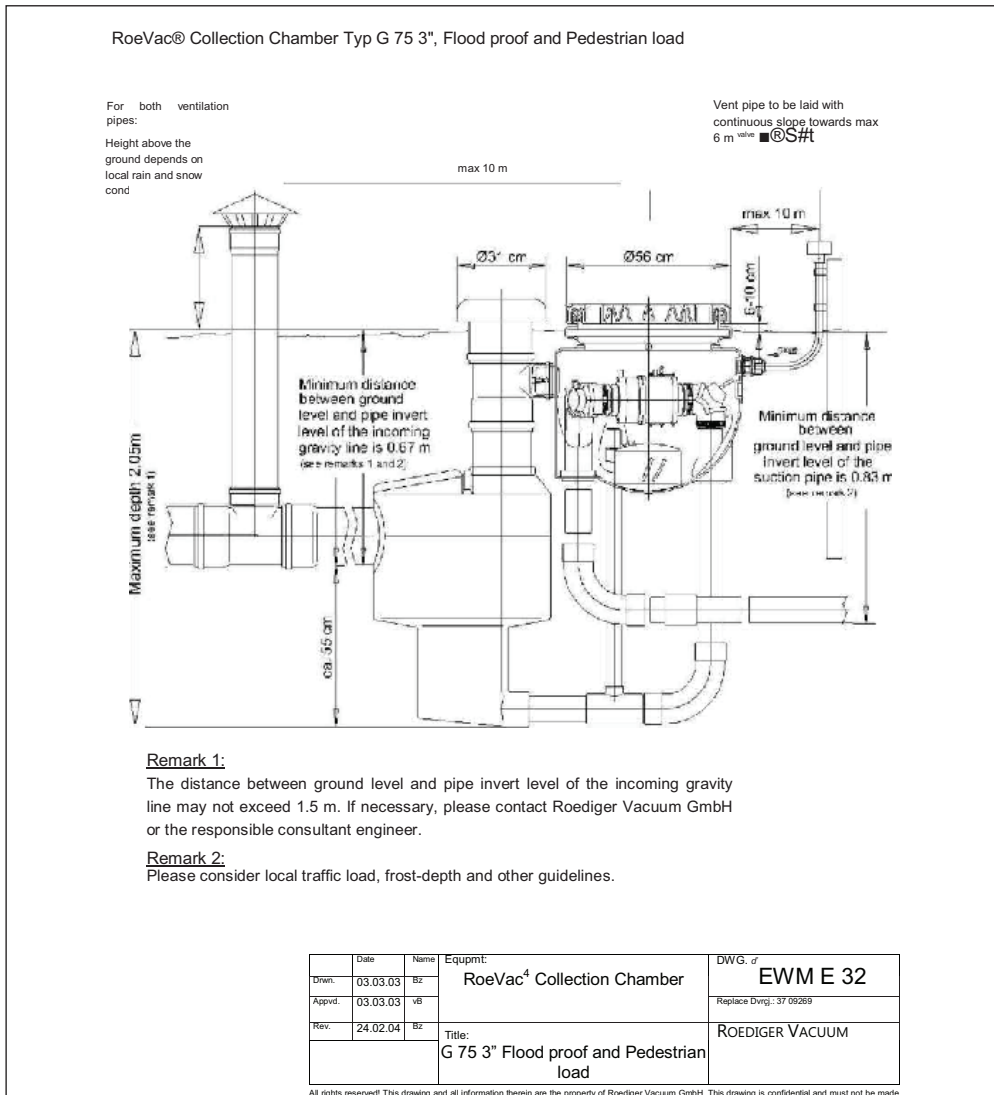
RoeVac Chamber type G 75 3" flood-proof and pedestrian load: Installation
